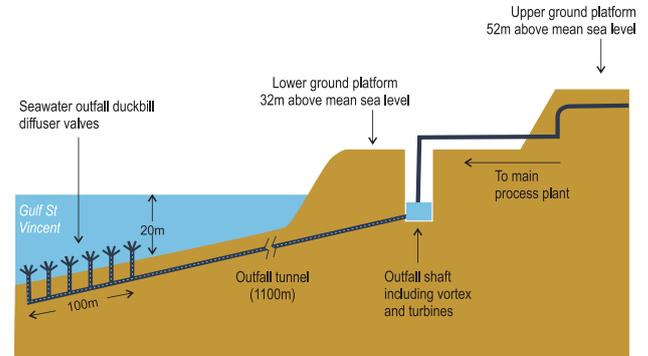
The outfall tunnel structure of the ADP (Aurecon Group).
